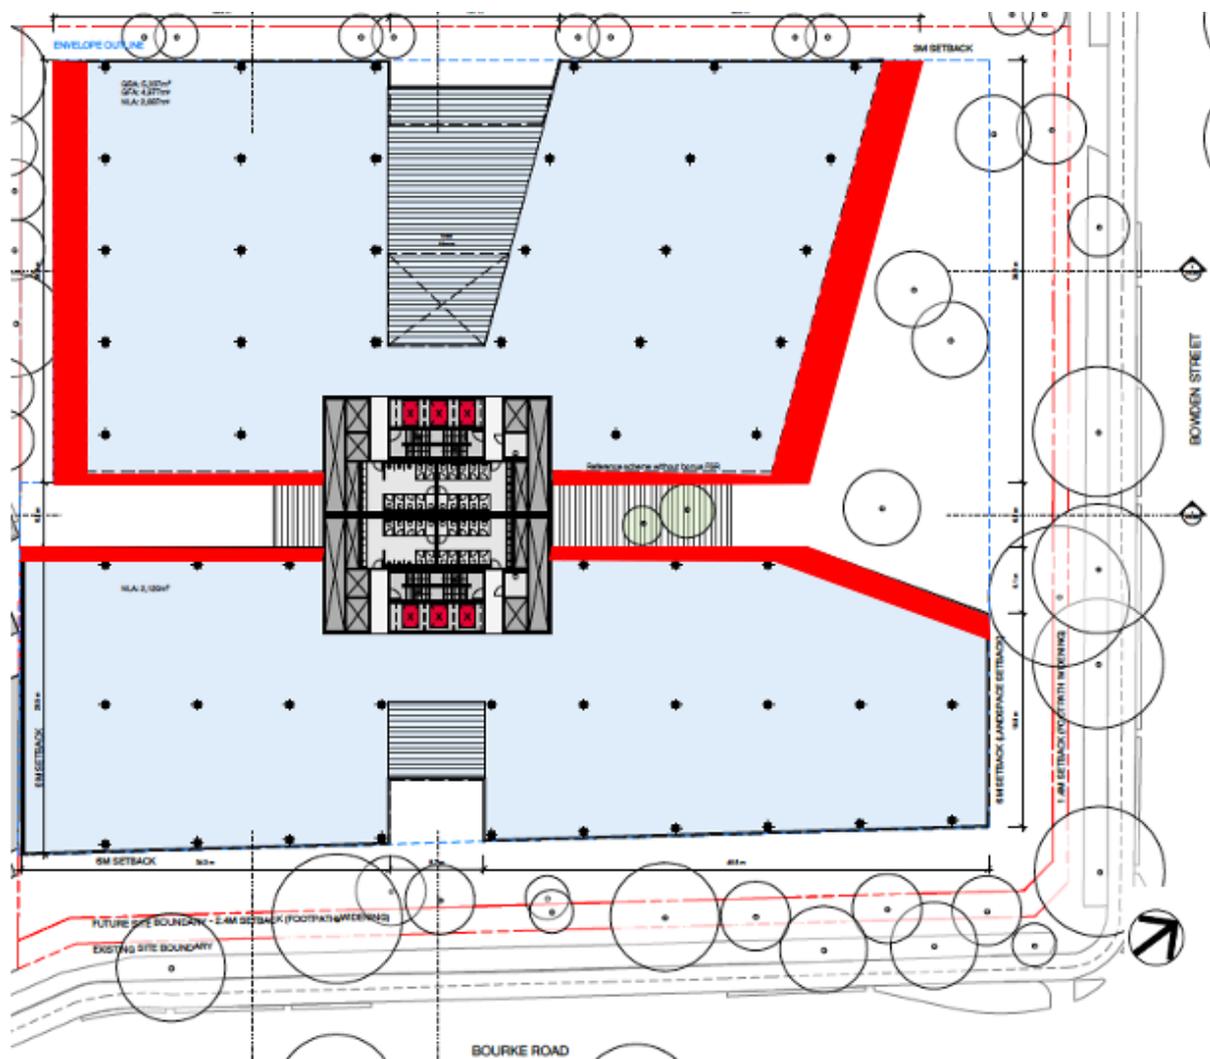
Proposed indicative concept design level 1 plan depicting additional 10% FSR in red. Other levels similar
